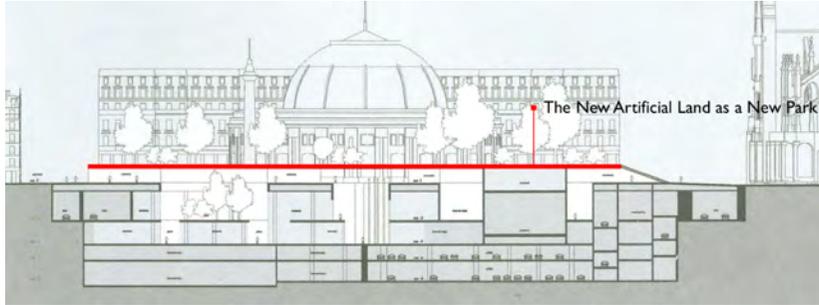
The North-South Section: The New Artificial Land on Second Floor.
